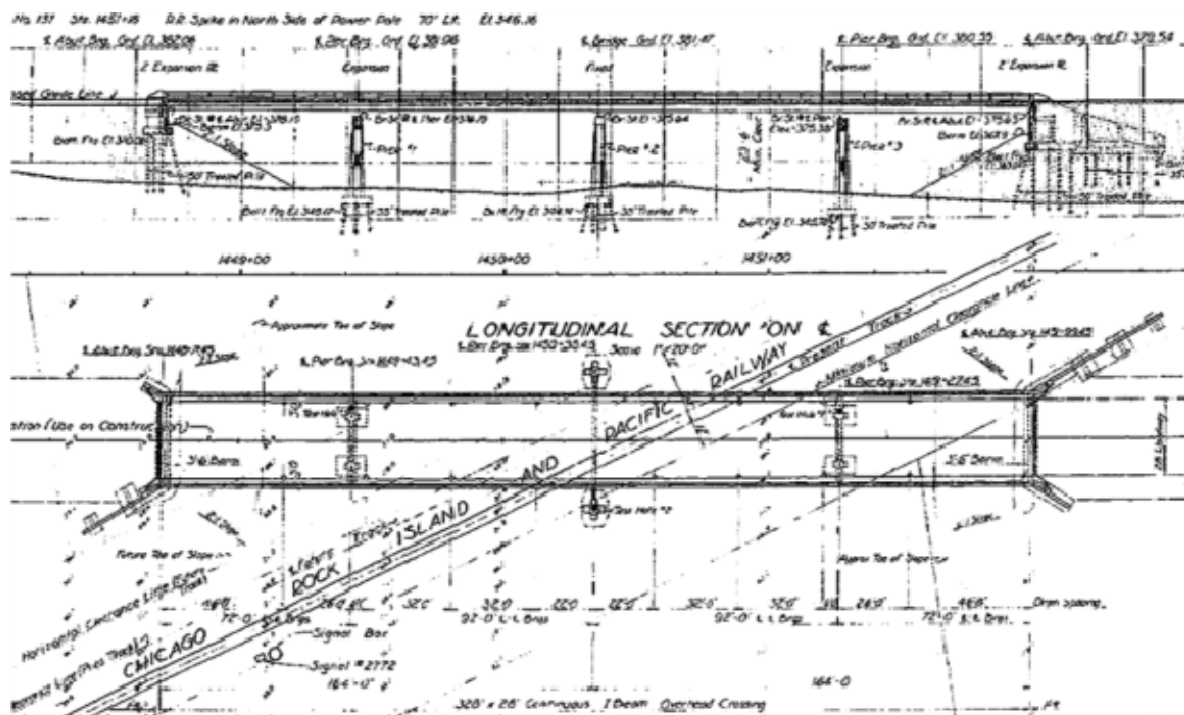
Bridge R2 longitudinal section, and situation (plan) view showing railroad beneath.
